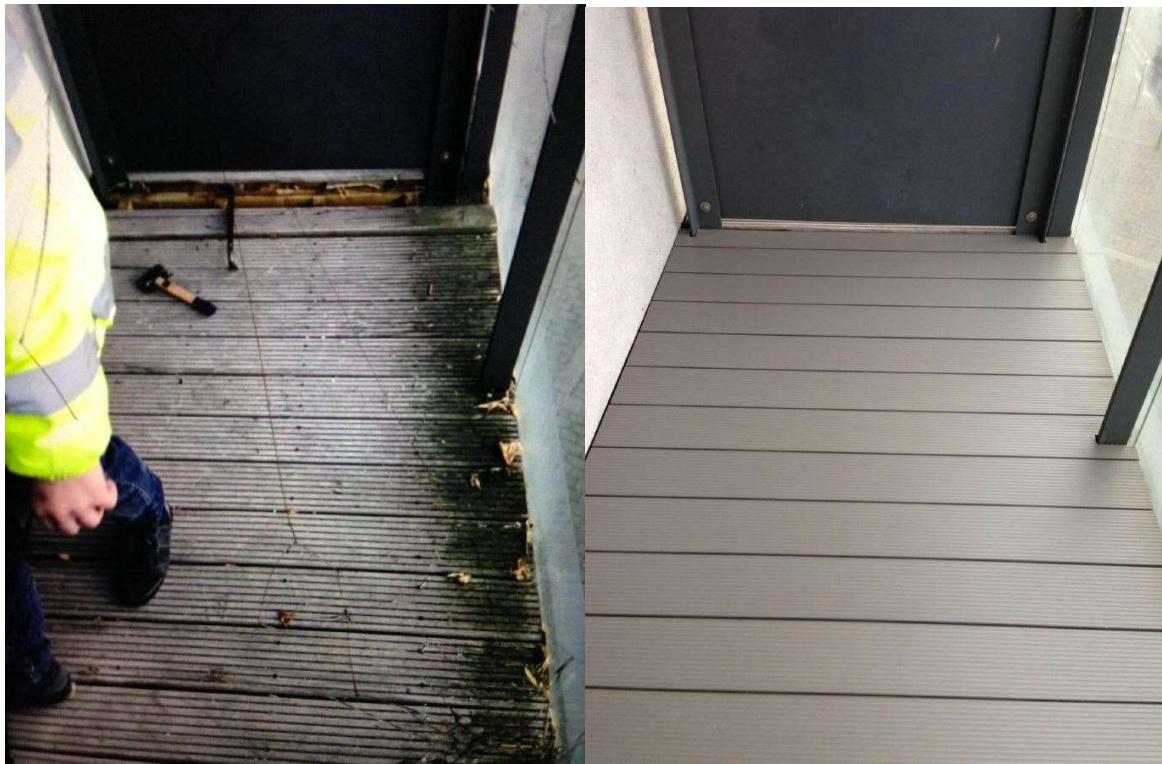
Third Example of a completed balcony decking replacement; the left-hand side photo shows the original timber decking balcony, the right-hand side photo shows the same balcony and the completed aluminium decking replacement.
